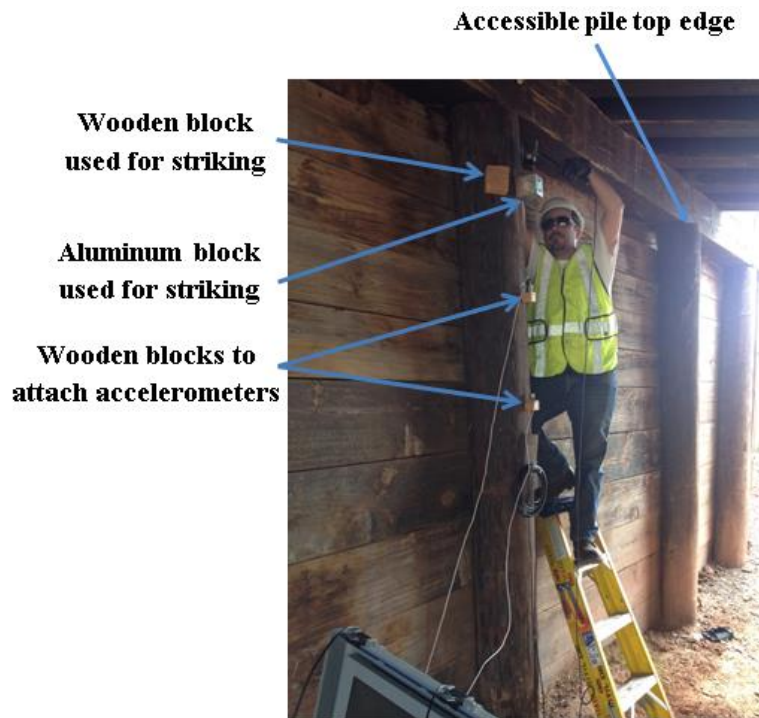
Typical SE Test Setup for Piles of Bridge No. 6922
